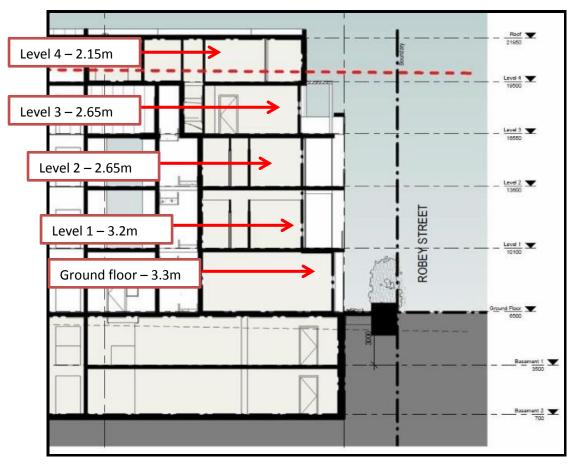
Proposed Ceiling Heights (Source: Brewster Murray, 3 November 2017)
